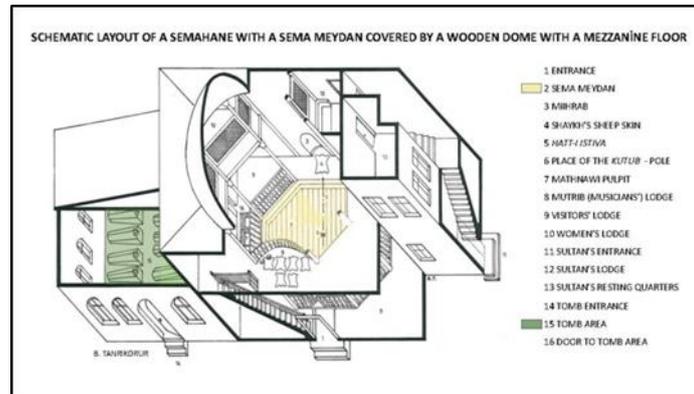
Schematic layout of a *semâ meydan* covered by a wooden dome with a mezzanine floor [1]
